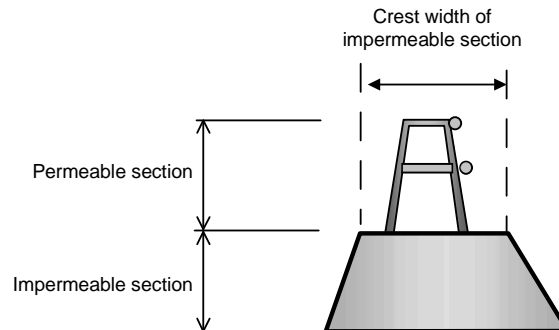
Lateral cross-section of the overflow section of a semi-open Sabo dam (example)
